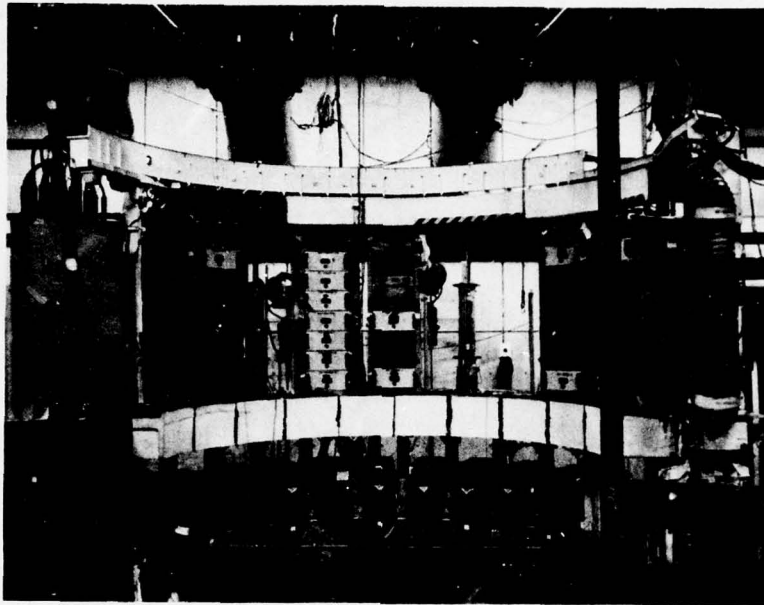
BLOCK 1 TEST ASSEMBLY
